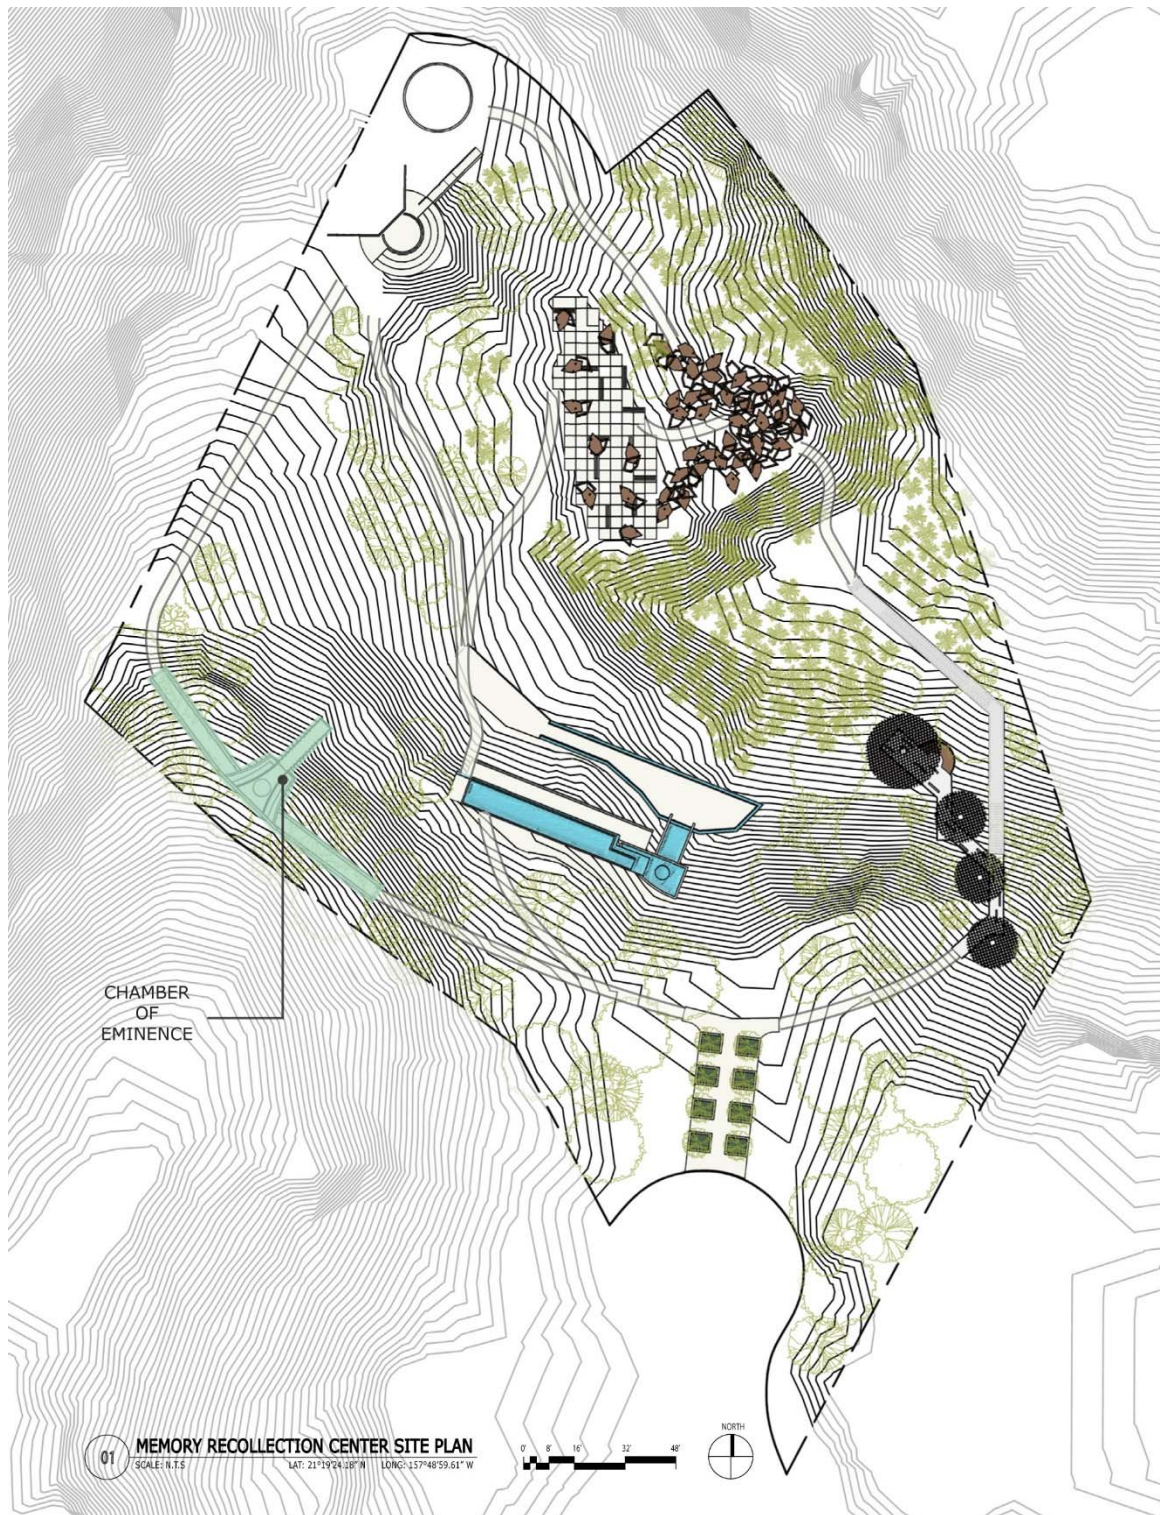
Memory Recollection Center Site Plan Indicating Location of Chamber of Eminence. Made by Author.
